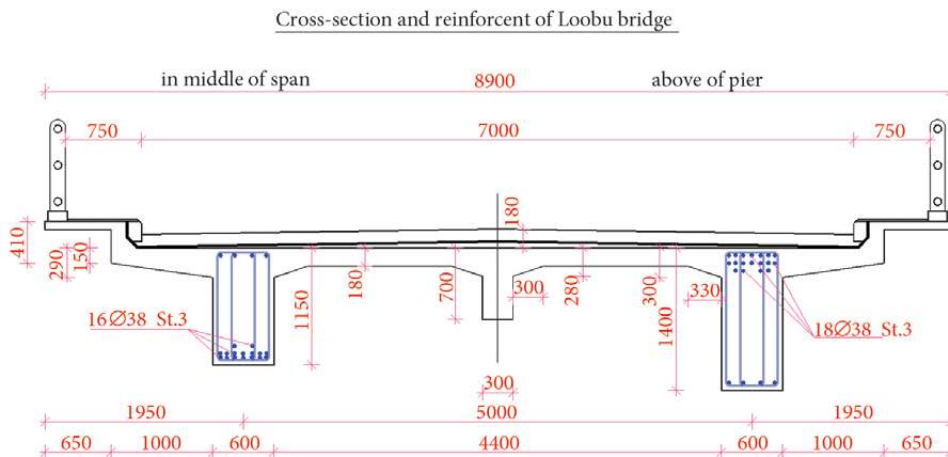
A cross-section and reinforcement (depicted as blue dots and blue line in the beams) of the tested bridge
